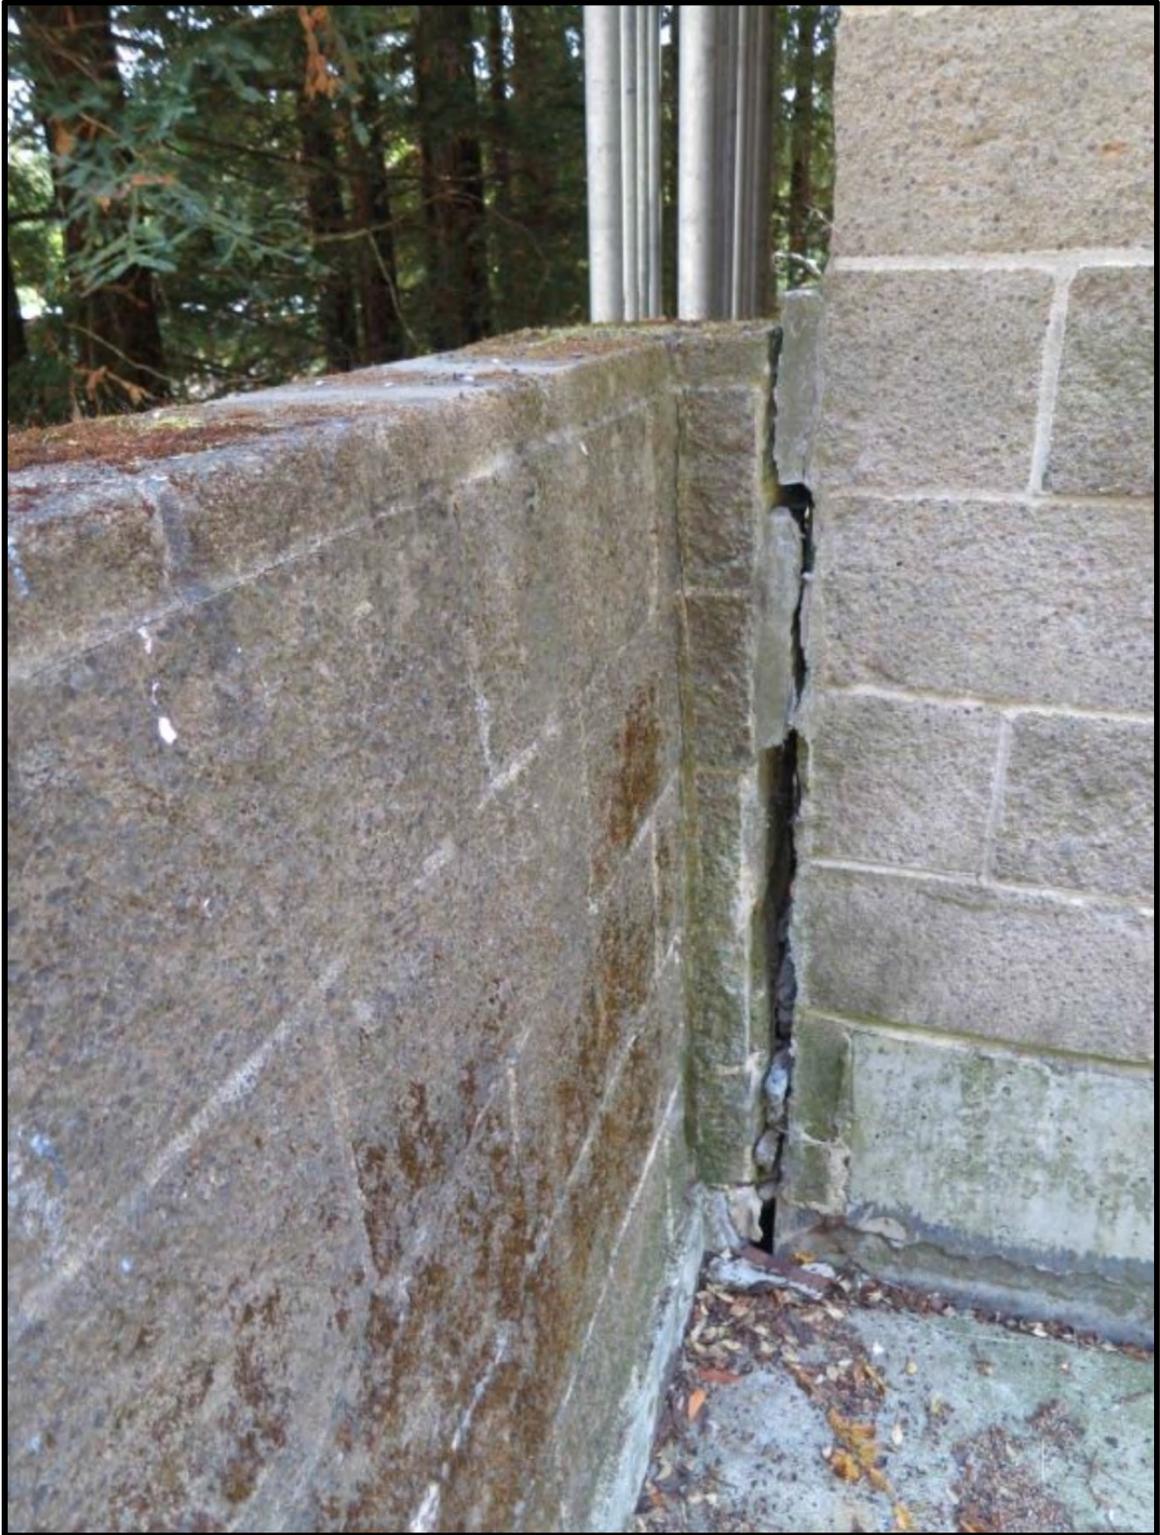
Separation of Parapet Wall (control building) from Solid Waste Building
